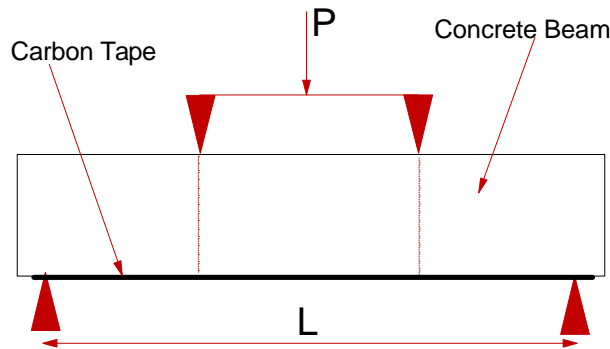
Test Setup for Third-Point Loading of CFRP-PCC Beam Specimens.
